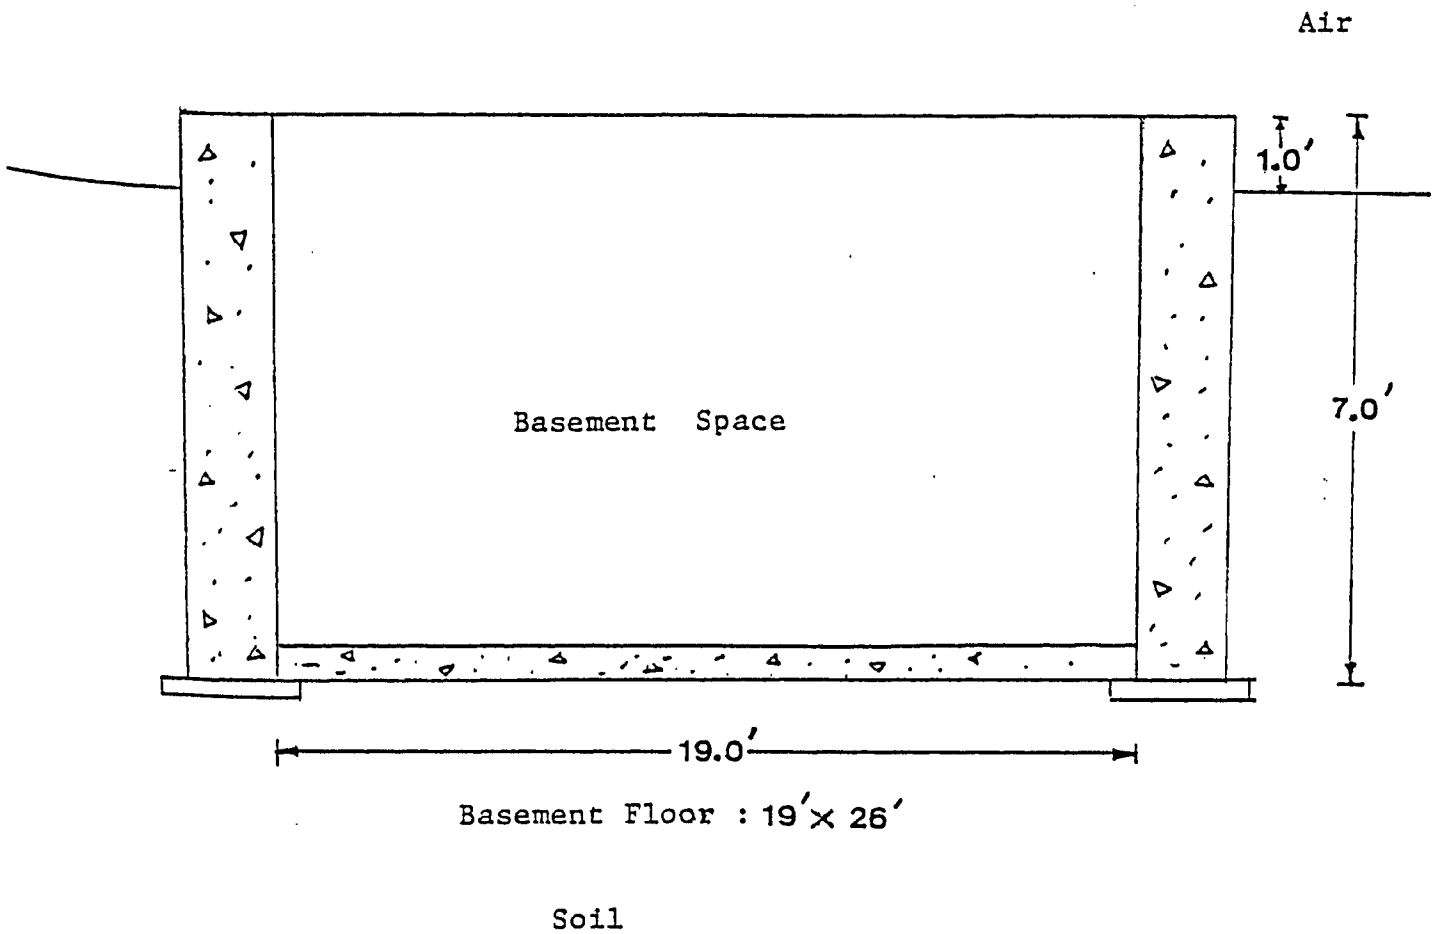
A Sectional View of the Basement of the "Villages of Riverside" House.
